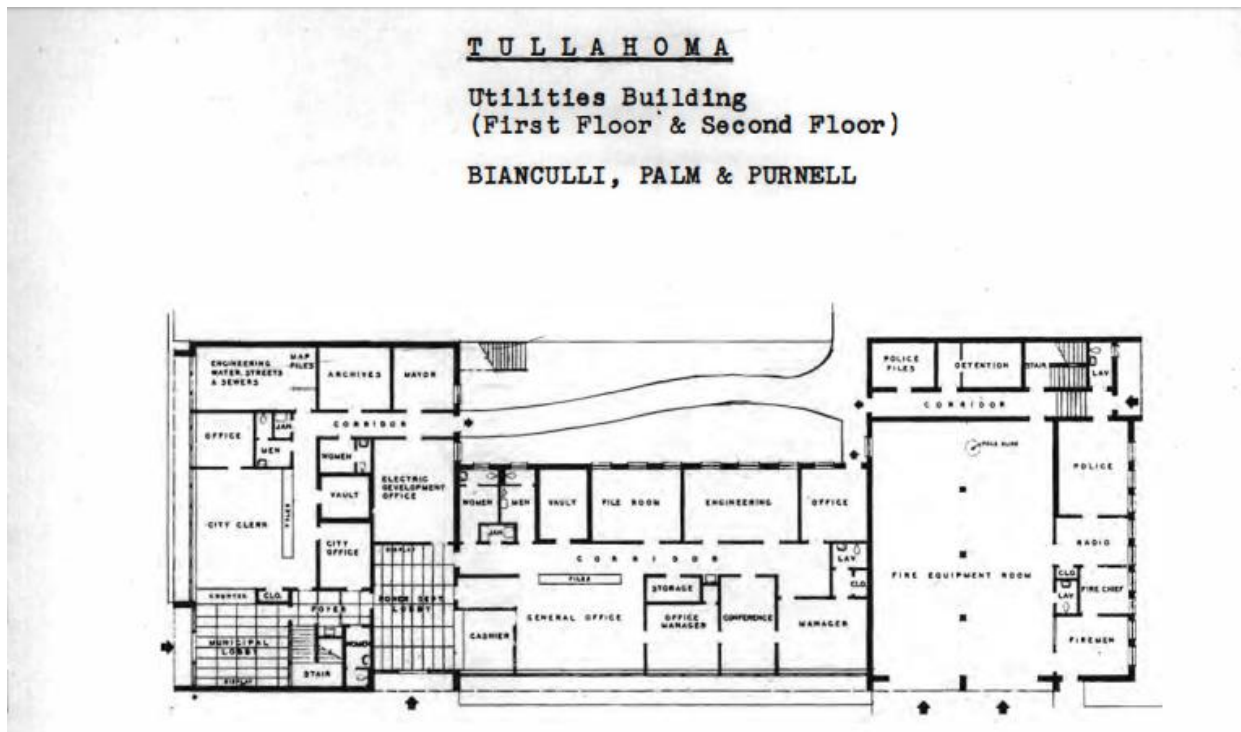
An original plan of the building that shows the two separate lobbies. Figure Source: Hobday, Victor C. “Documents Relating to Joint Electric System Municipal Buildings.” (1953) *MTAS Publications: Full Publications*. Accessed January 23, 2018. http://trace.tennessee.edu/utk_mtaspubs/4/.
